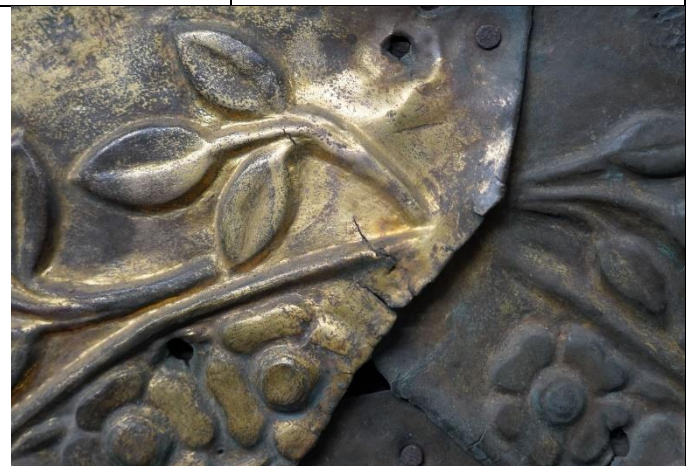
Cracks in the Torana's copper sheet repousse, May 2024
